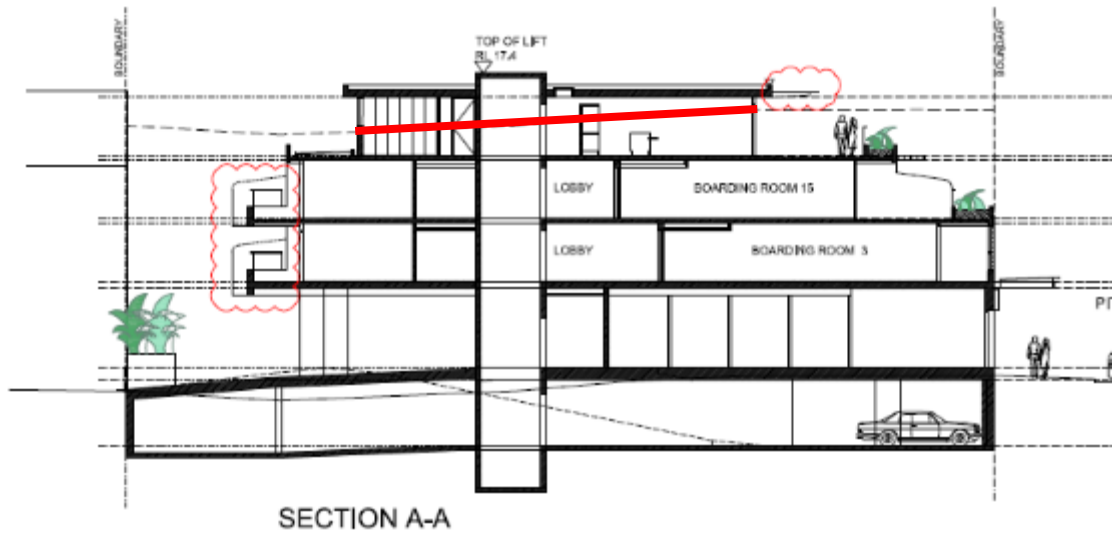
Plan (section A-A) extract showing extent of 11 metre building height breach
